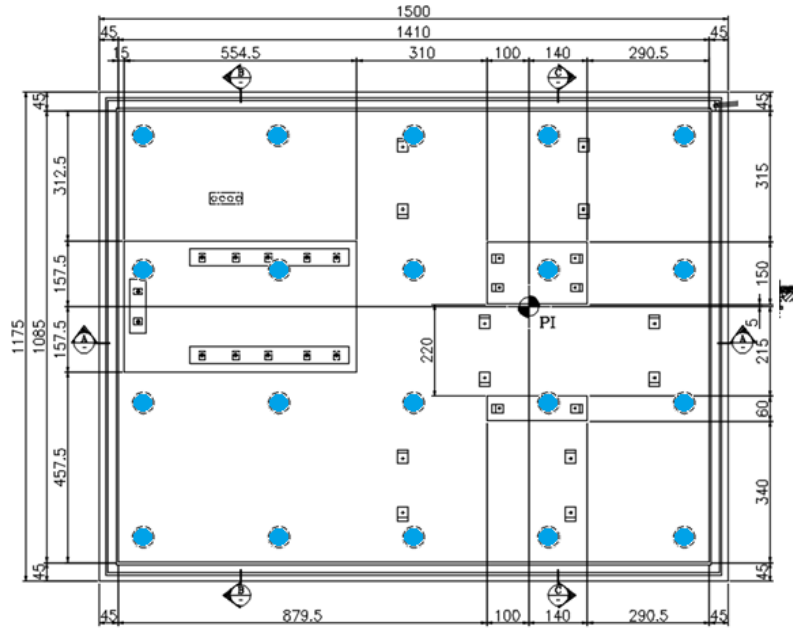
Plan view from the concrete foundation and piles (dimensions in centimeters).
